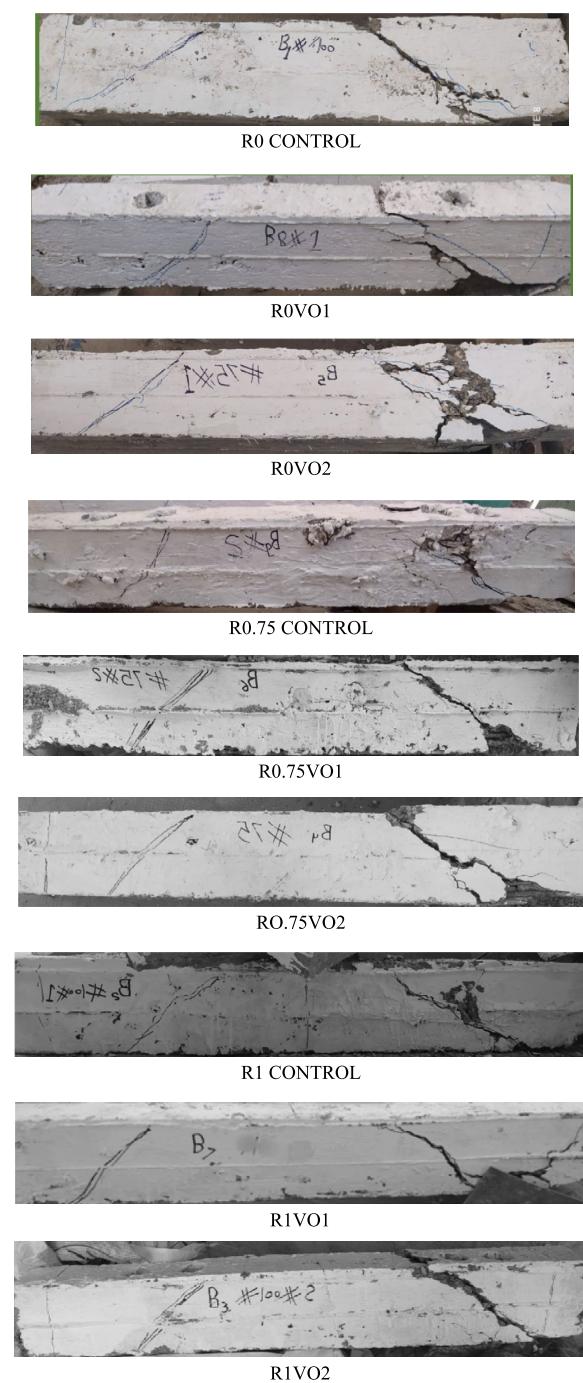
Failure modes and crack patterns of all tested RUC beams
